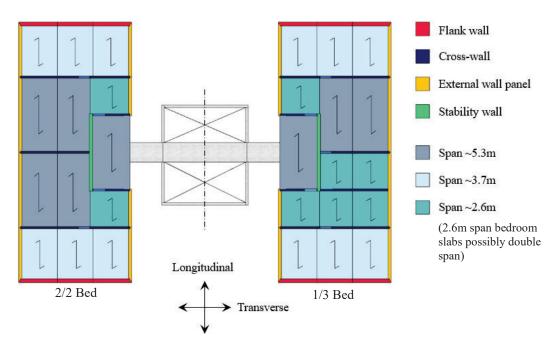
Approximate floorplan of each block, illustrating the clear span dimensions. Again, for illustrative purposes, a one and three bedroom flat layout is shown on the same floor as a two bedroom flat layout.
